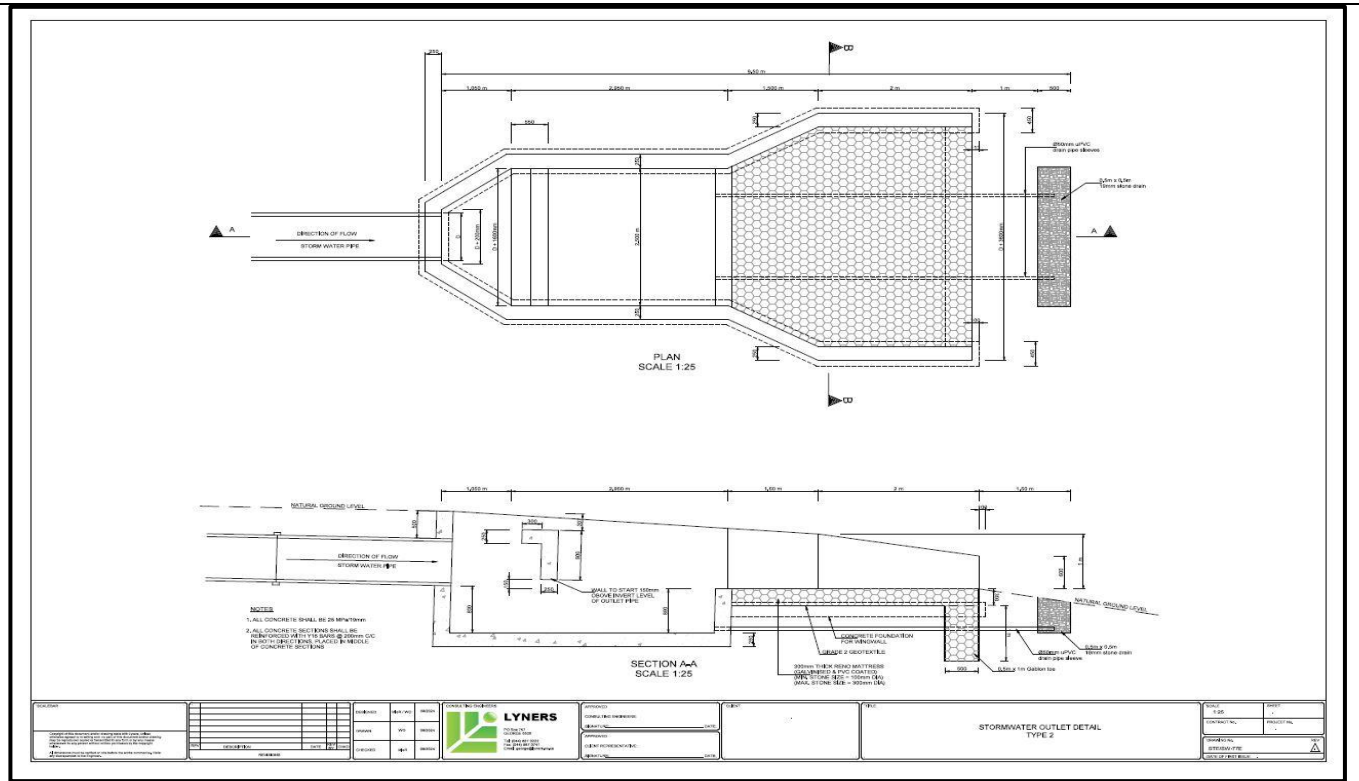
Stormwater Outlet Structure Design Drawing 1.
